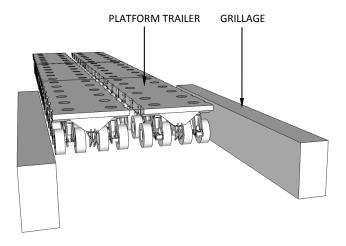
Example of the use of a grillage for unloading platform trailers
